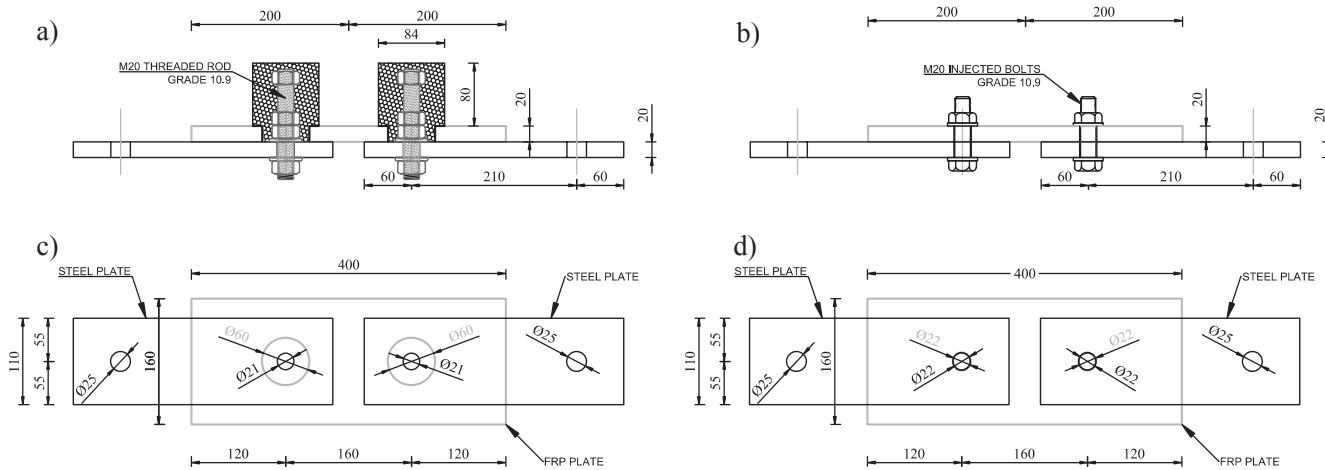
FRP-Steel SLJ connection specimens. (a) iSRR specimen, (b) IB specimen, (c) top view iSRR specimen and (d) top view IB specimen.
